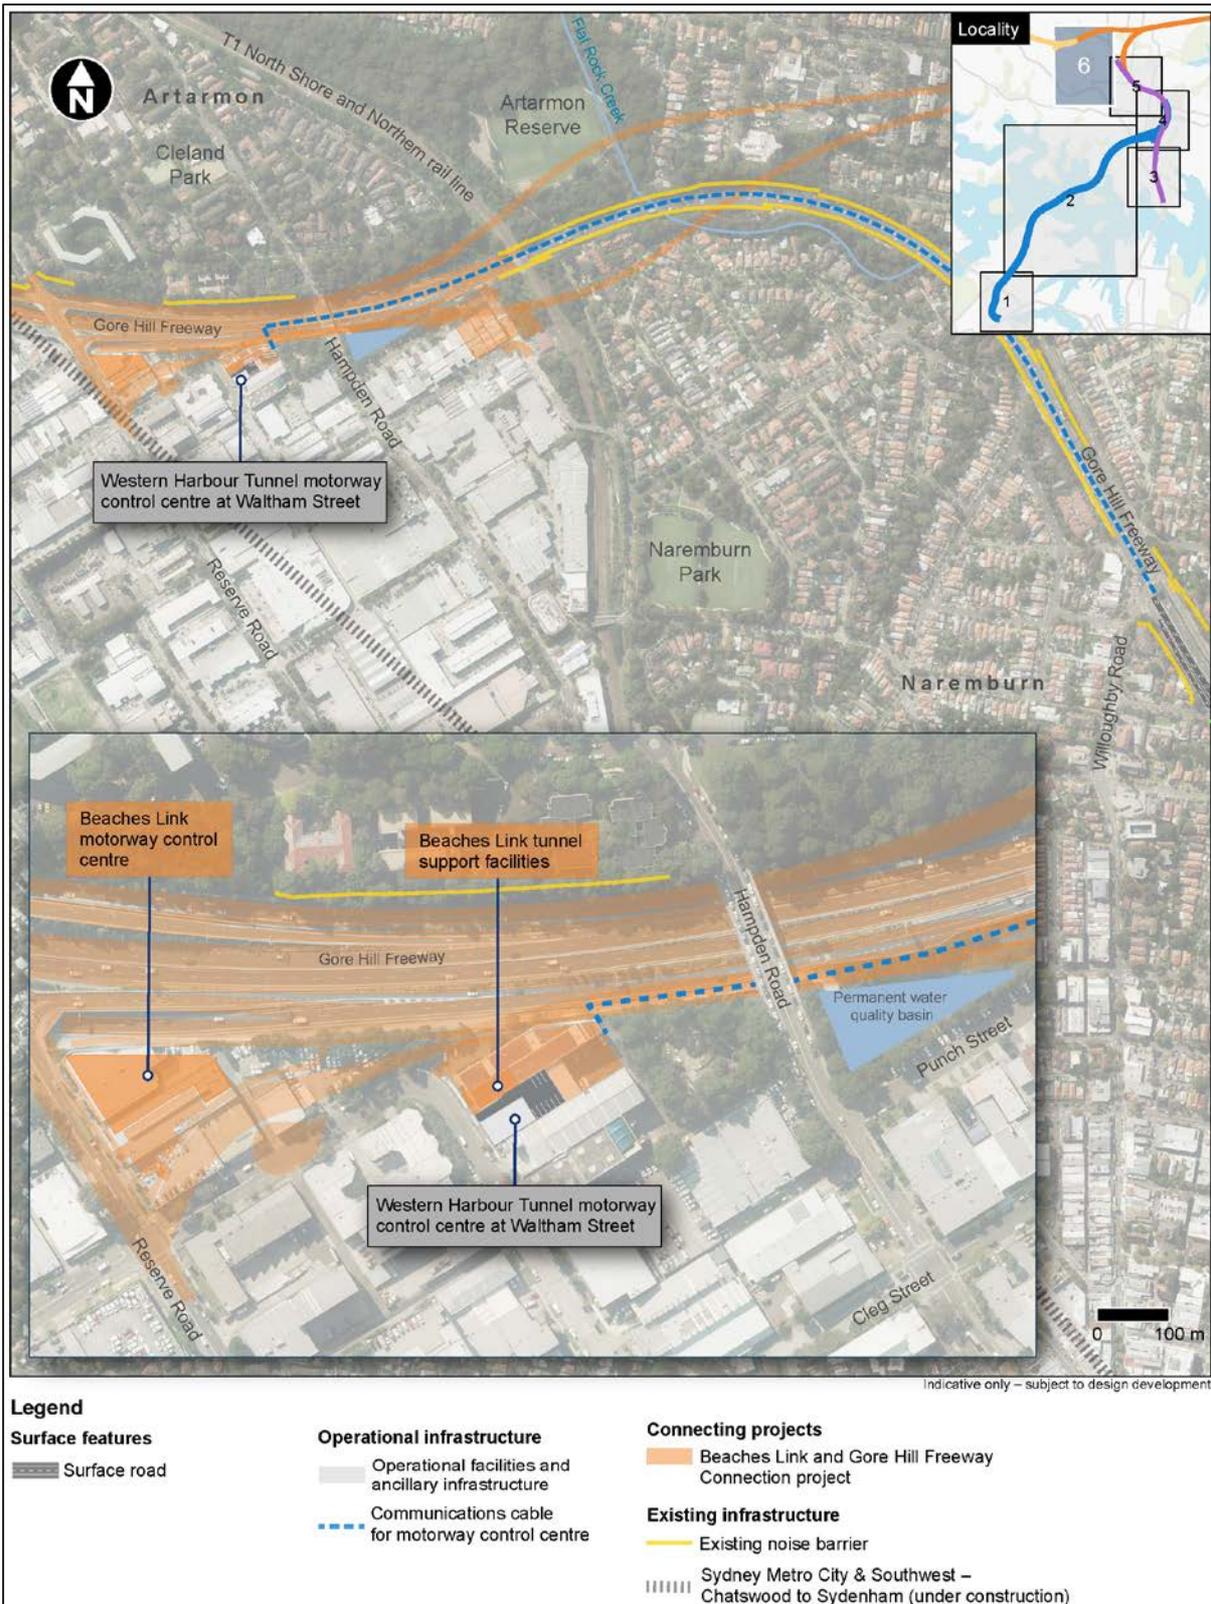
| Project Layout: Proposed Beaches Link tunnel ancillary sites (Source: EIS)
